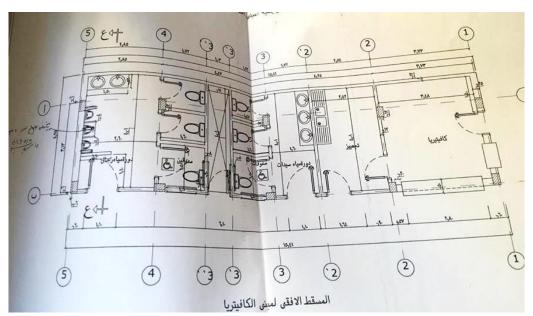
the proposed plan of the Building service by the Ministry of Antiquities Source: Ministry of Antiquities.
